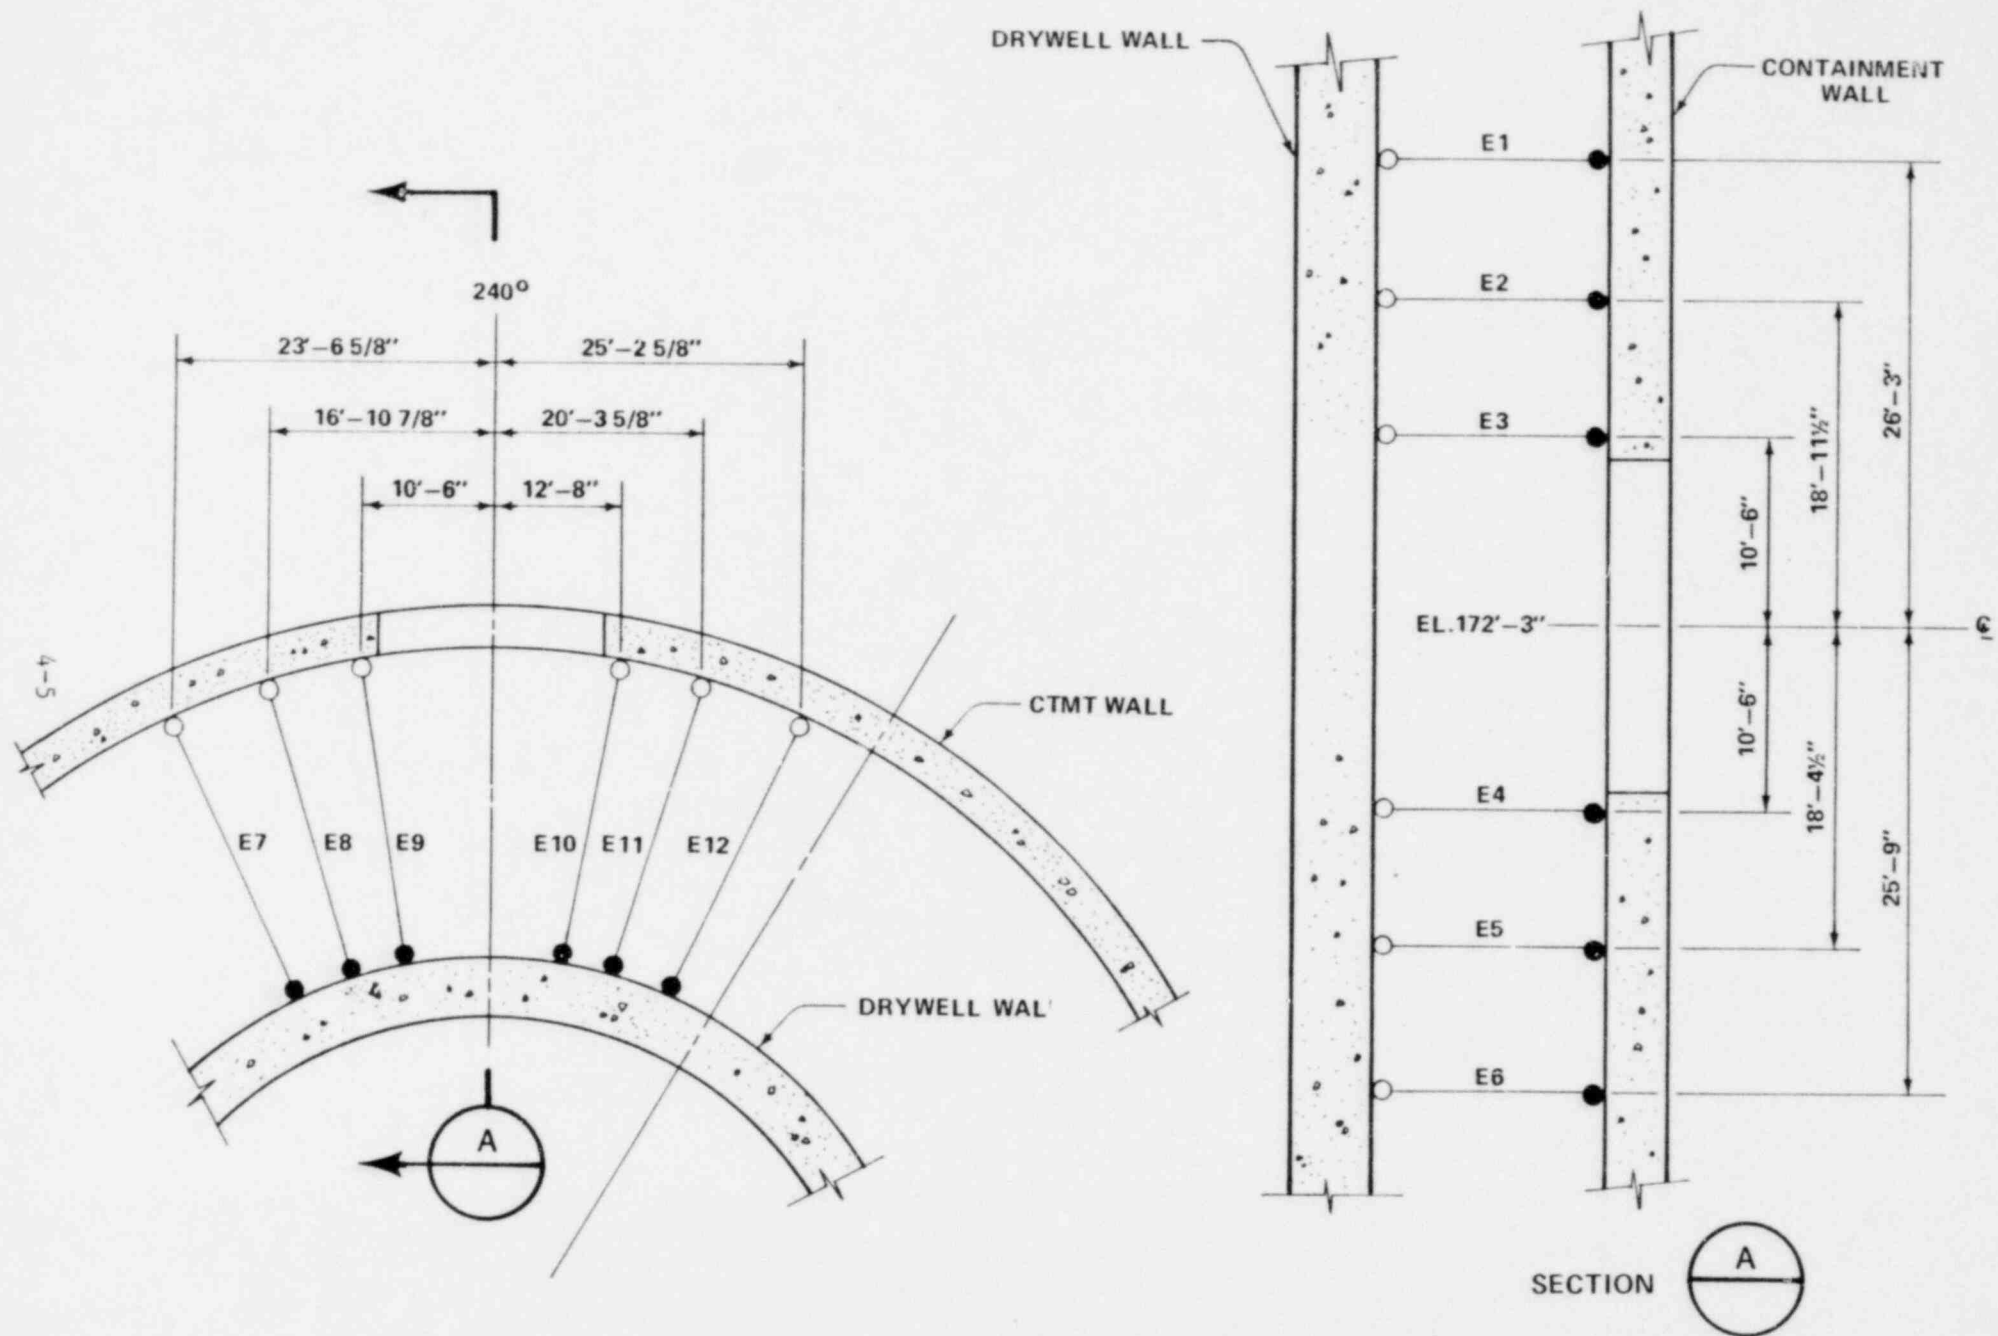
TAUT WIRE EXTENSOMETER LOCATIONS - EQUIPMENT HATCH
